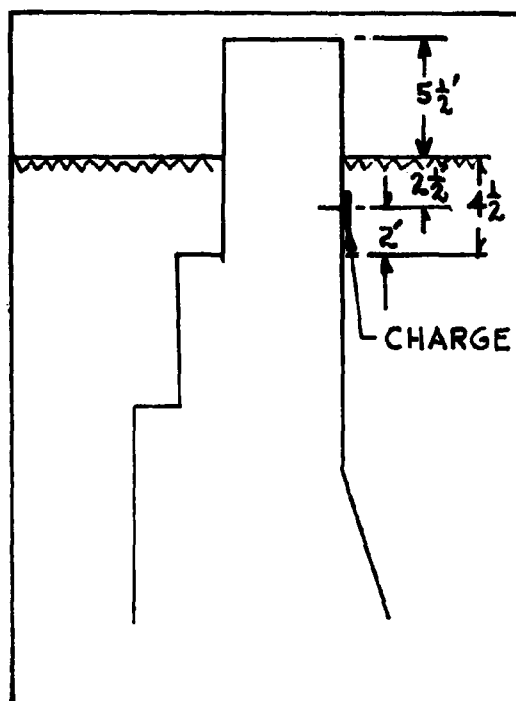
Cross section of upper guide wall showing 40-pound charge placed on wall $2\frac{1}{2}$ feet below water level. Charge did not effectively breach wall.
